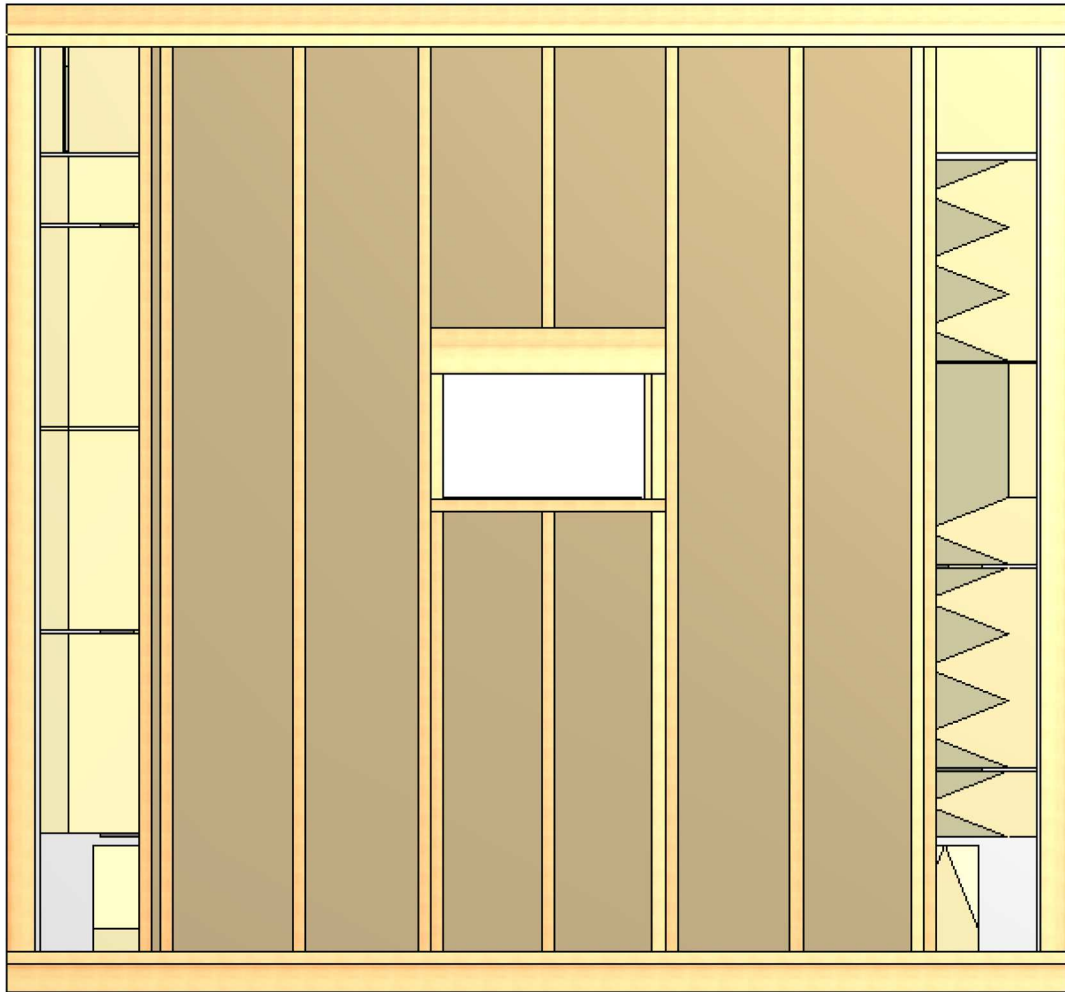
East wall outside structure. This wall houses the opening for the jet to enter the facility.
